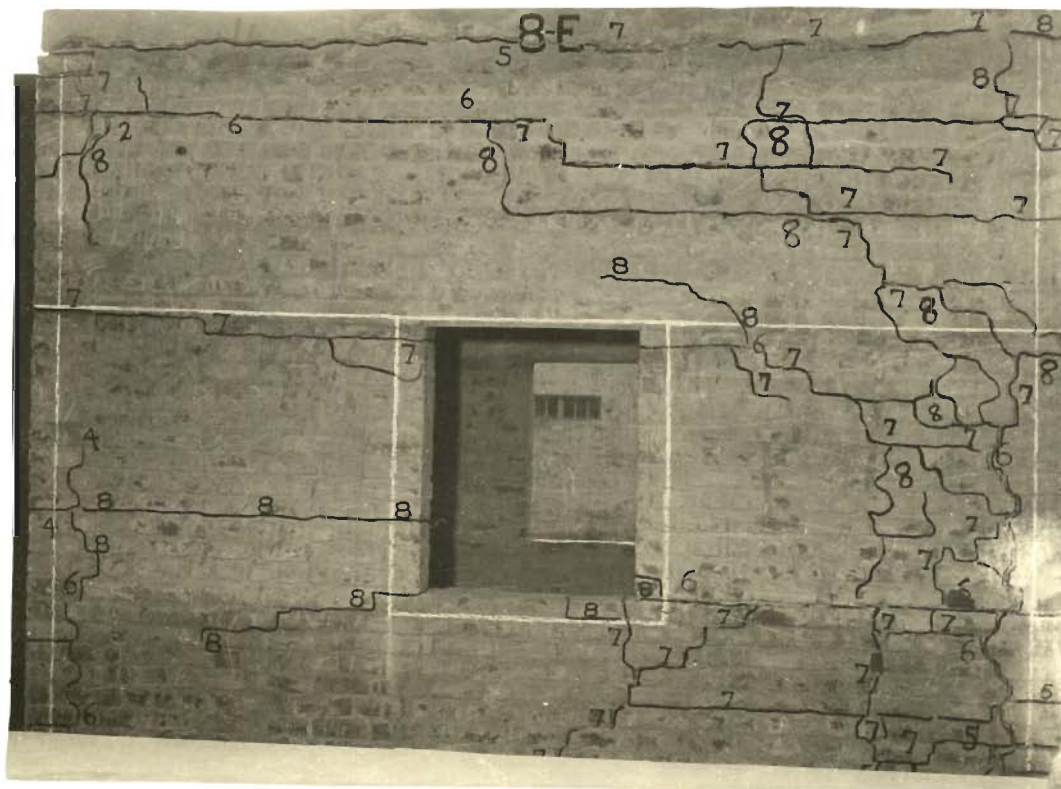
\_SEVERLY DAMAGED EAST CROSS WALL DURING SHOCK NO.8 (MODEL 8)
